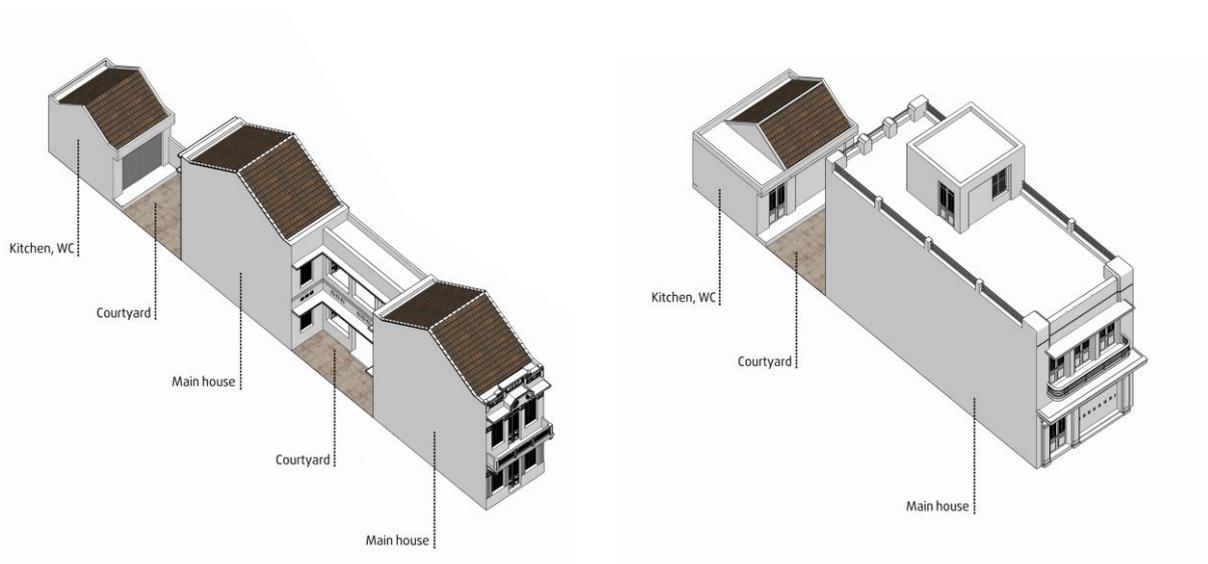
Structure of a typical French colonial townhouse in the Old Quarter of Hanoi (Dang Viet Long, 2022)
